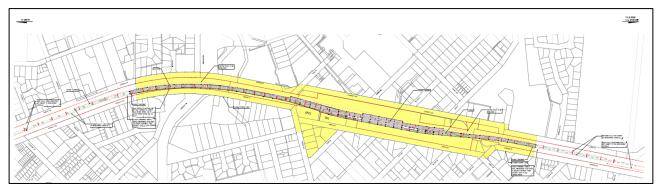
Viaduct Plan (Viaduct shown in grey shading)
